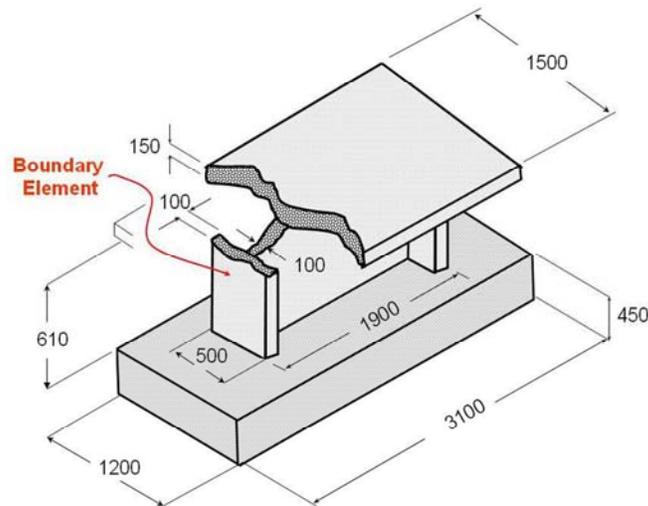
Tilt-up of laboratory tested shear wall with boundary elements (dimensions in mm)
